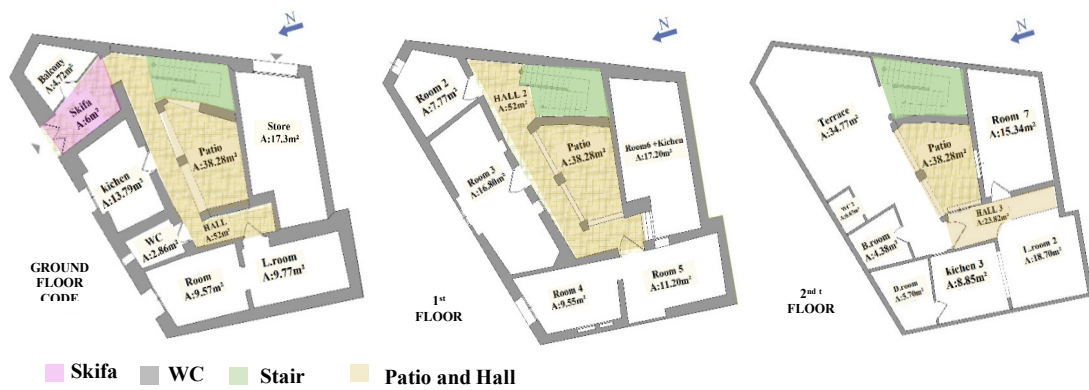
Ground floor plan, 1st and 2nd floor. code 356.
